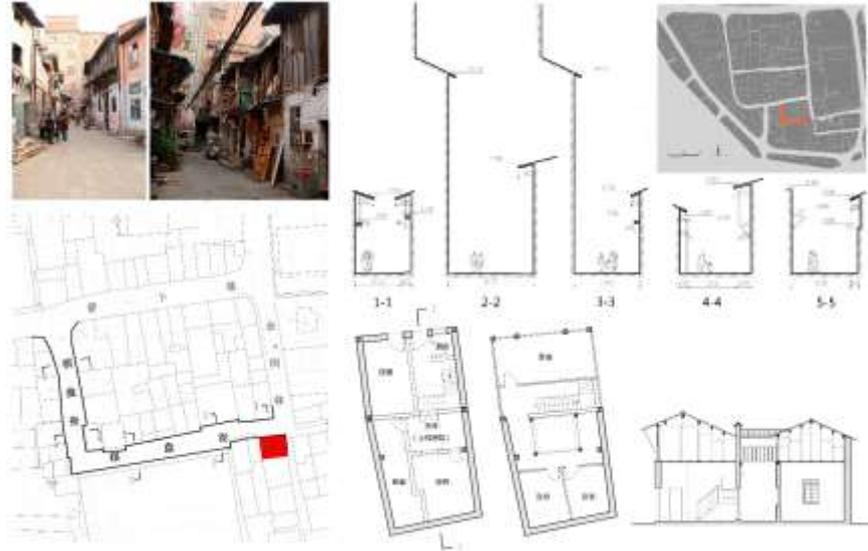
Measurement of existing buildings and street geometry on the example of the Qipanjie street [7].
